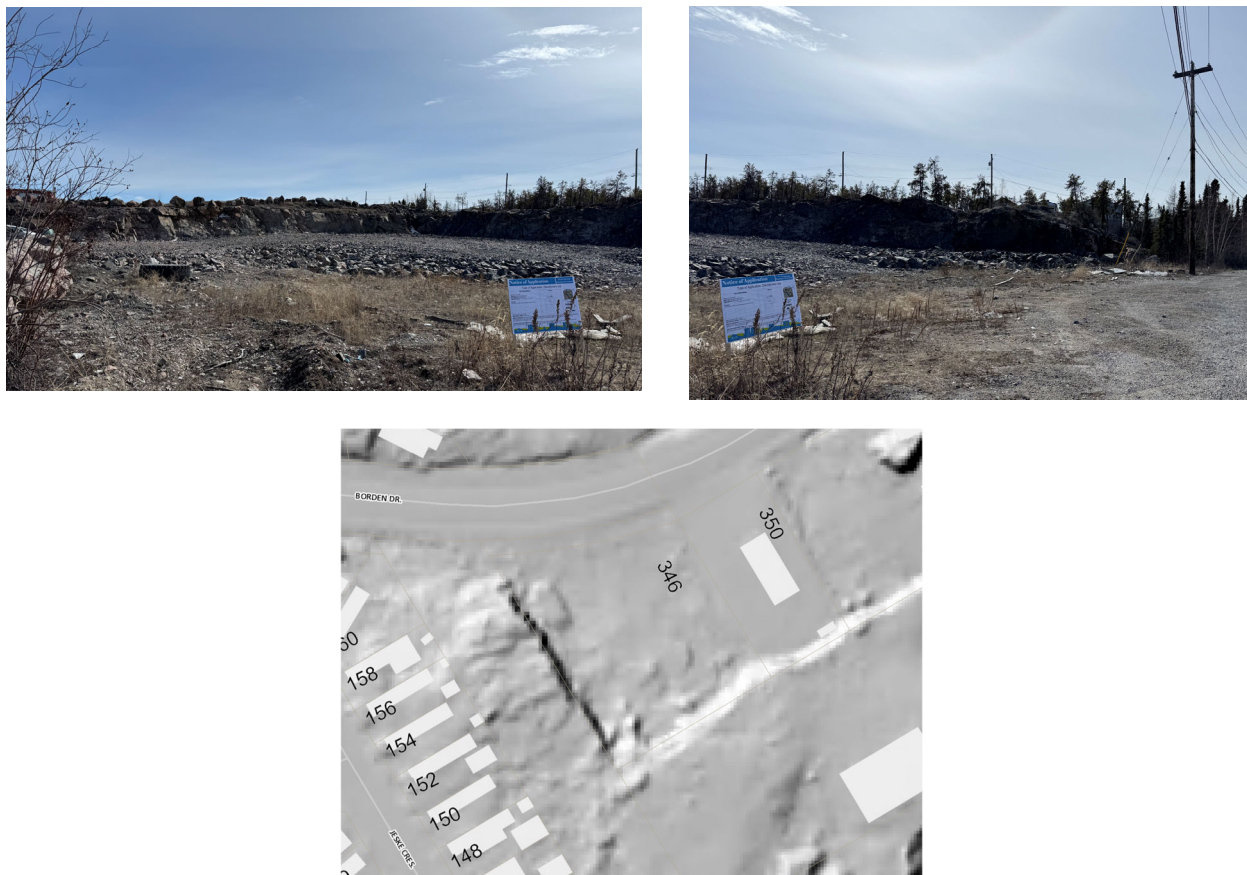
Rockface to the back of the subject land around 6 m high (top left photo); Rockface to the west of the subject land around 10 m high (top right photo); hillshade map of the subject land and surrounding areas showing the elevation difference (bottom photo).
